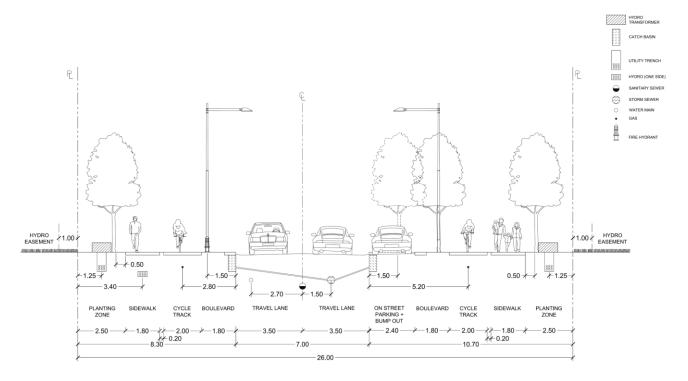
Wanaki Road Cross Section, Facing North (Former CFB Rockcliffe Community Design Plan)
